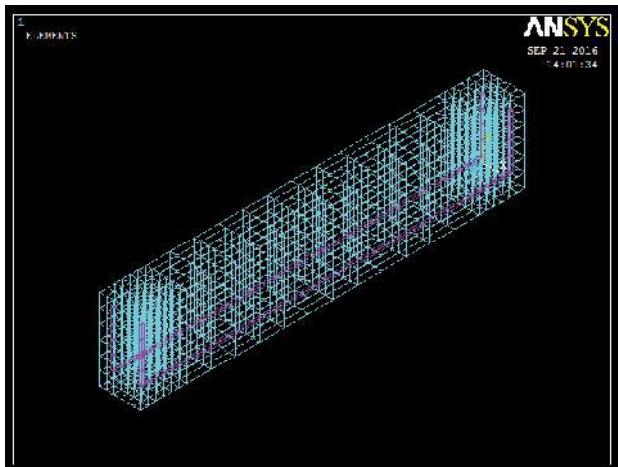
3D Modeling of nominal tension reinforced concrete beam
